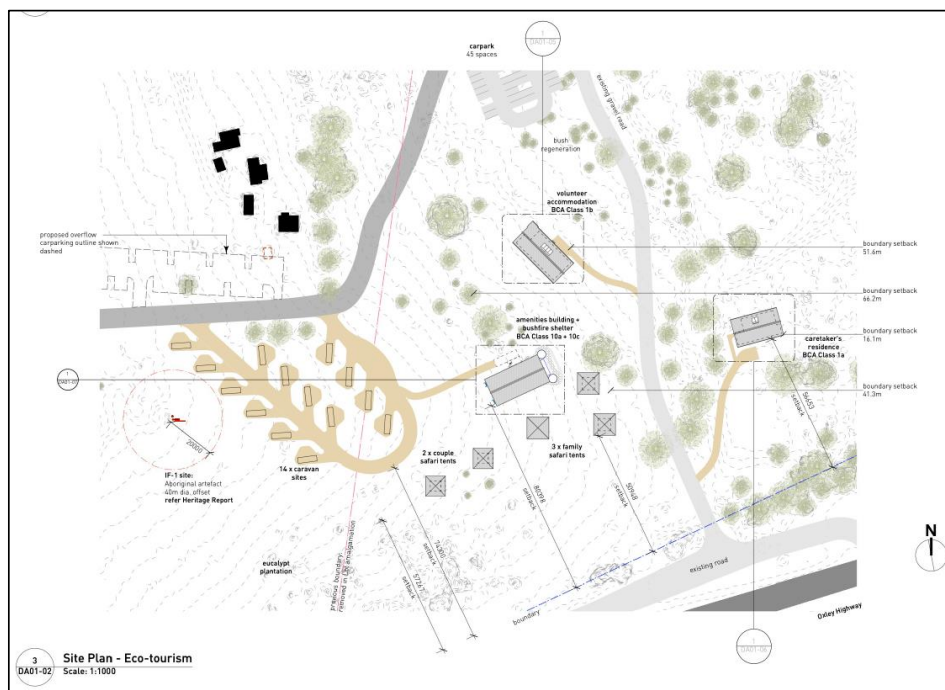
Detailed Site Plan (residential accommodation and camping ground)
